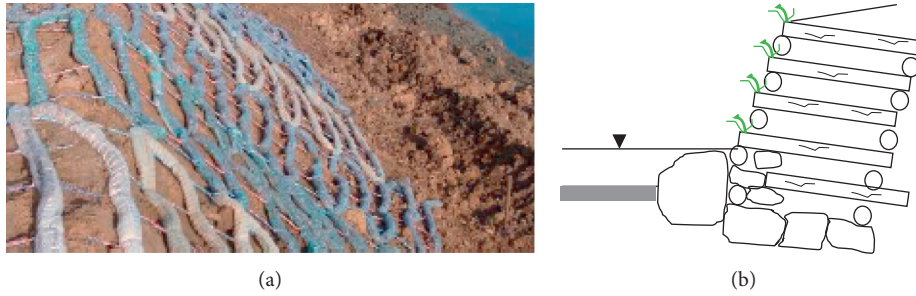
(a) Example of wool geotextiles. (b) Example of woods crib walls.
